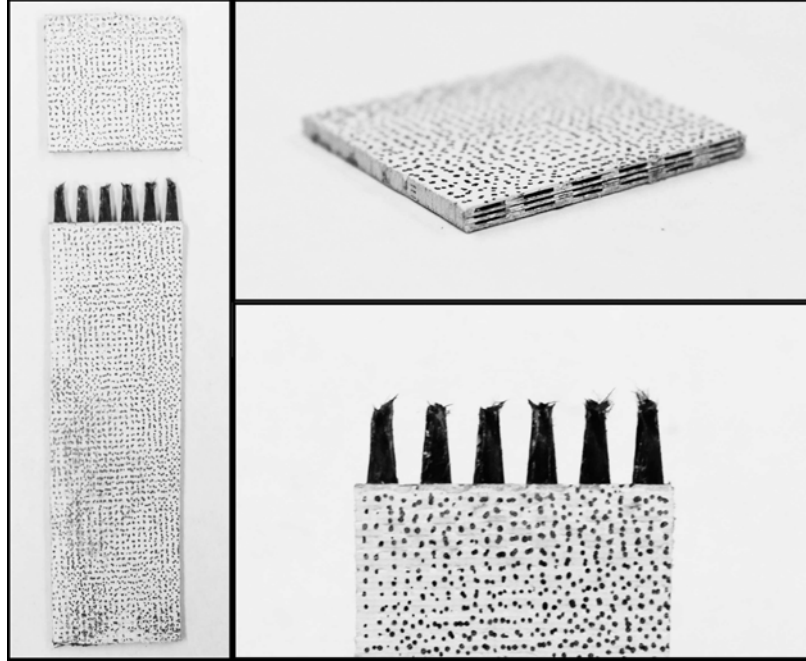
3-CF-layer sample after tensile testing (speckled for DIC measurements).
